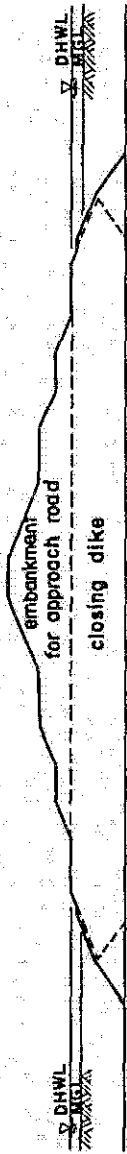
Standard Cross Section of Closing Dike (Scale 1/500)
